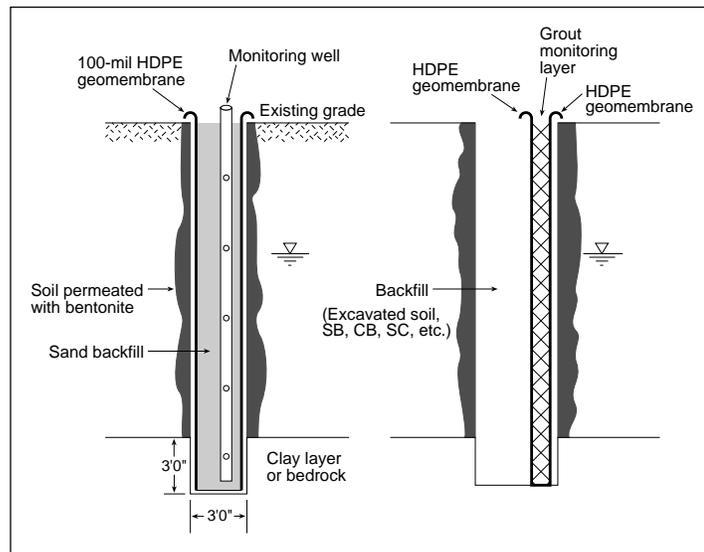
Two possible doublewall schemes for leak detection monitoring
